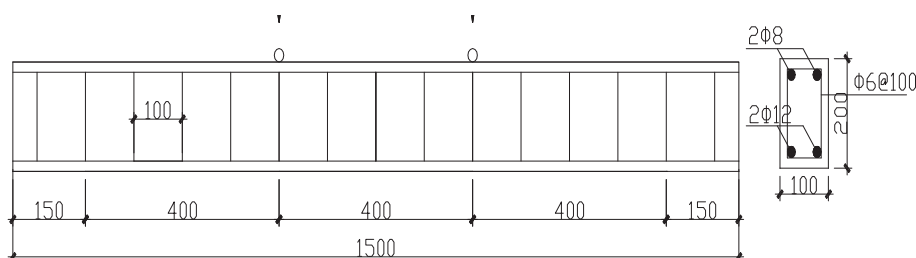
Sectional dimensions of specimen and cross-section (unit: mm).
